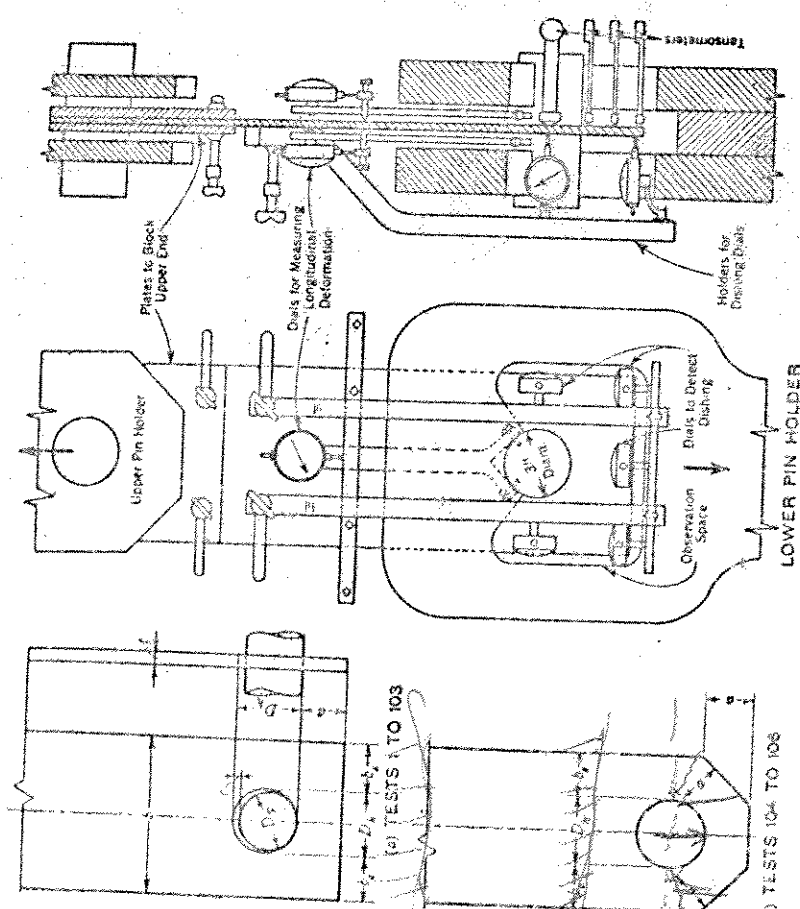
APPARATUS FOR TESTING PIN-CONNECTED STEEL PLATE LINKS
